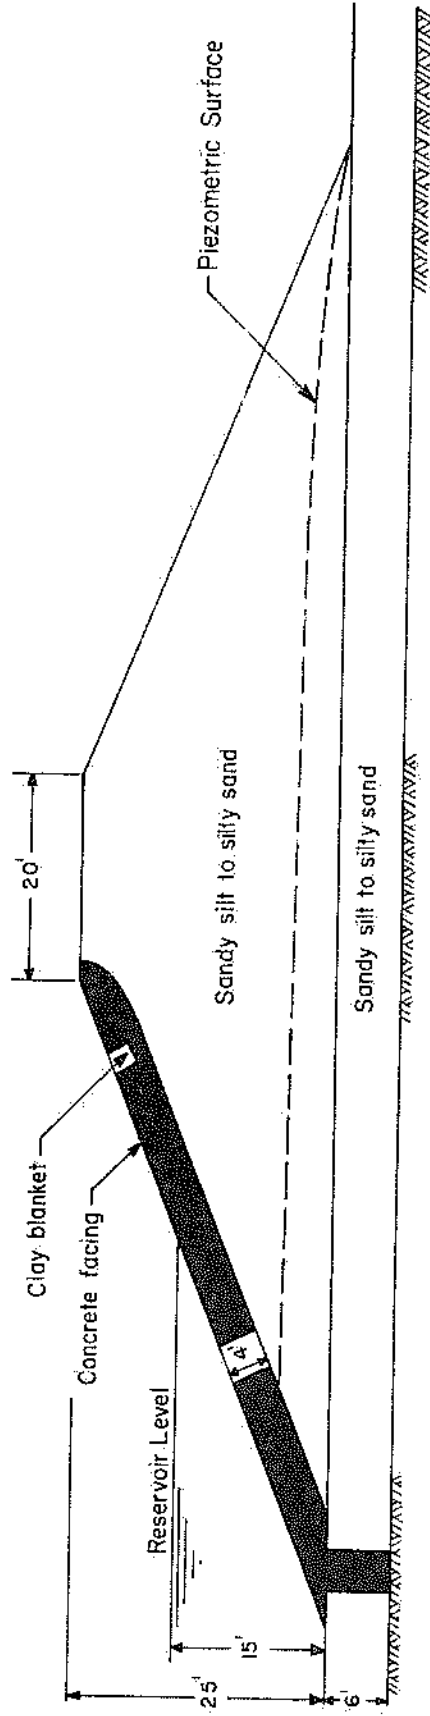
CROSS-SECTION THROUGH EMBANKMENT
